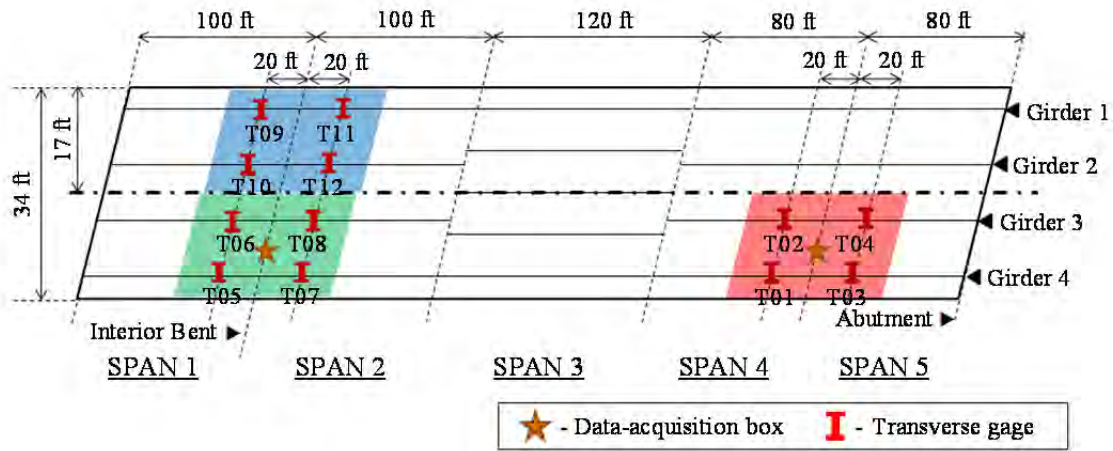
Gage layout for transverse bars, Lampasas River Bridge
